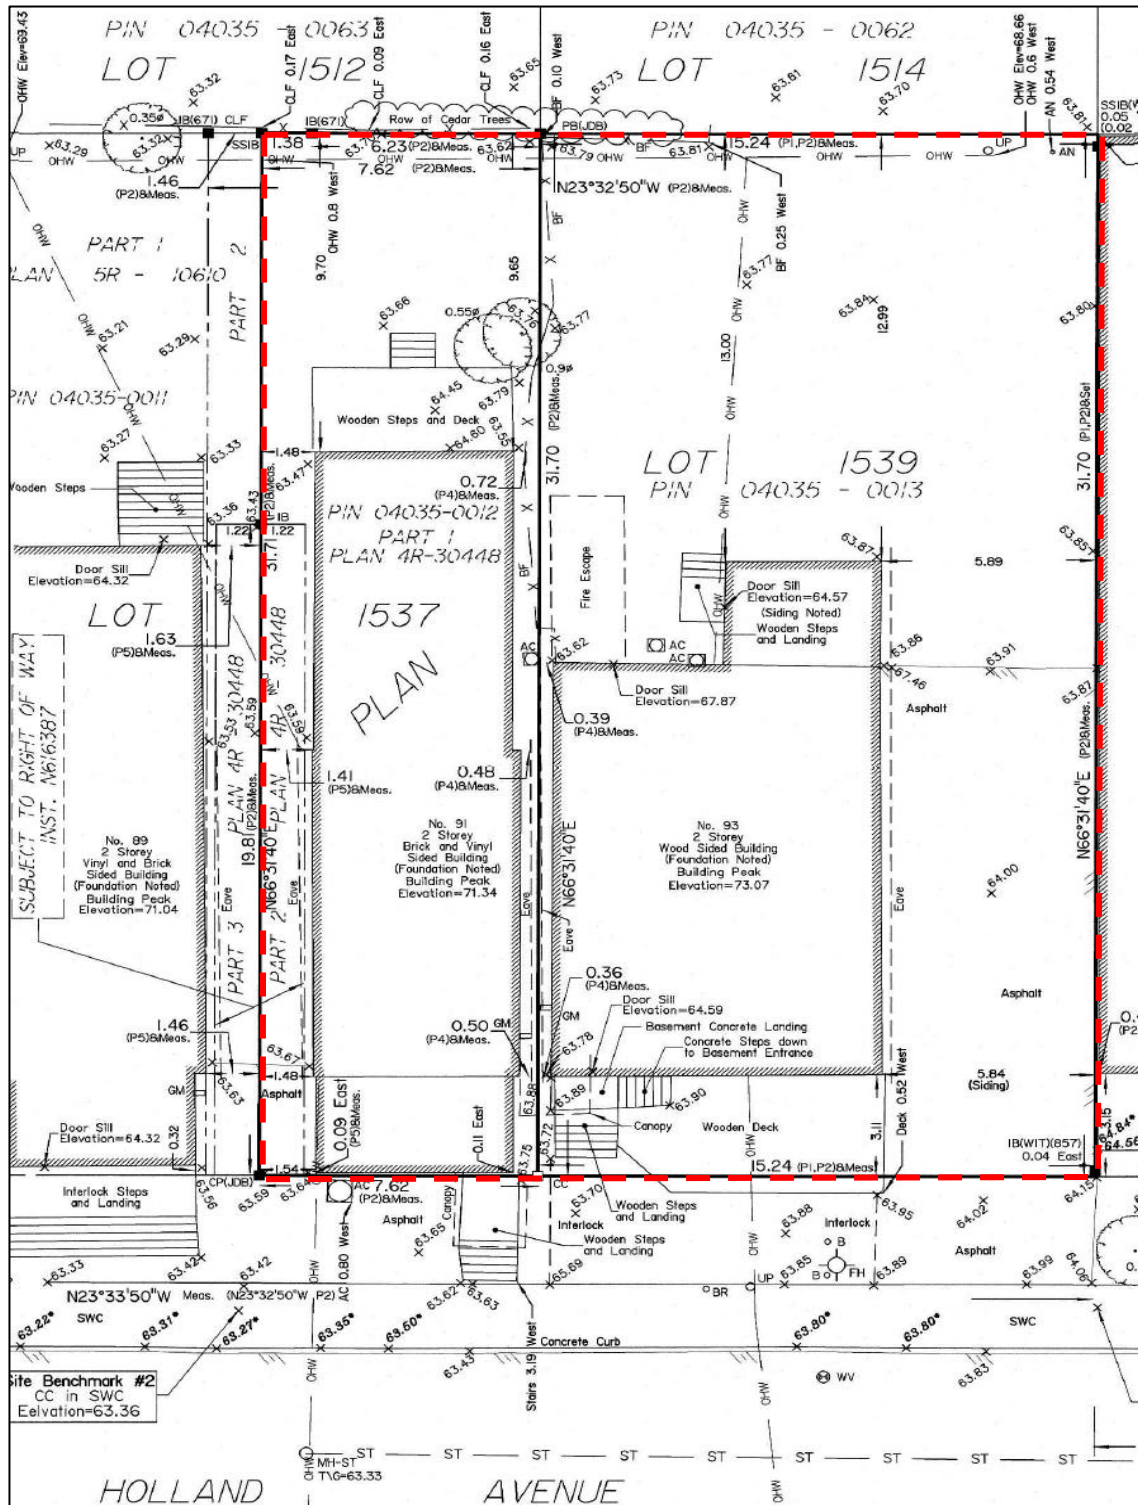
Excerpt from Survey Plan showing the site (red outline) and existing structures.
